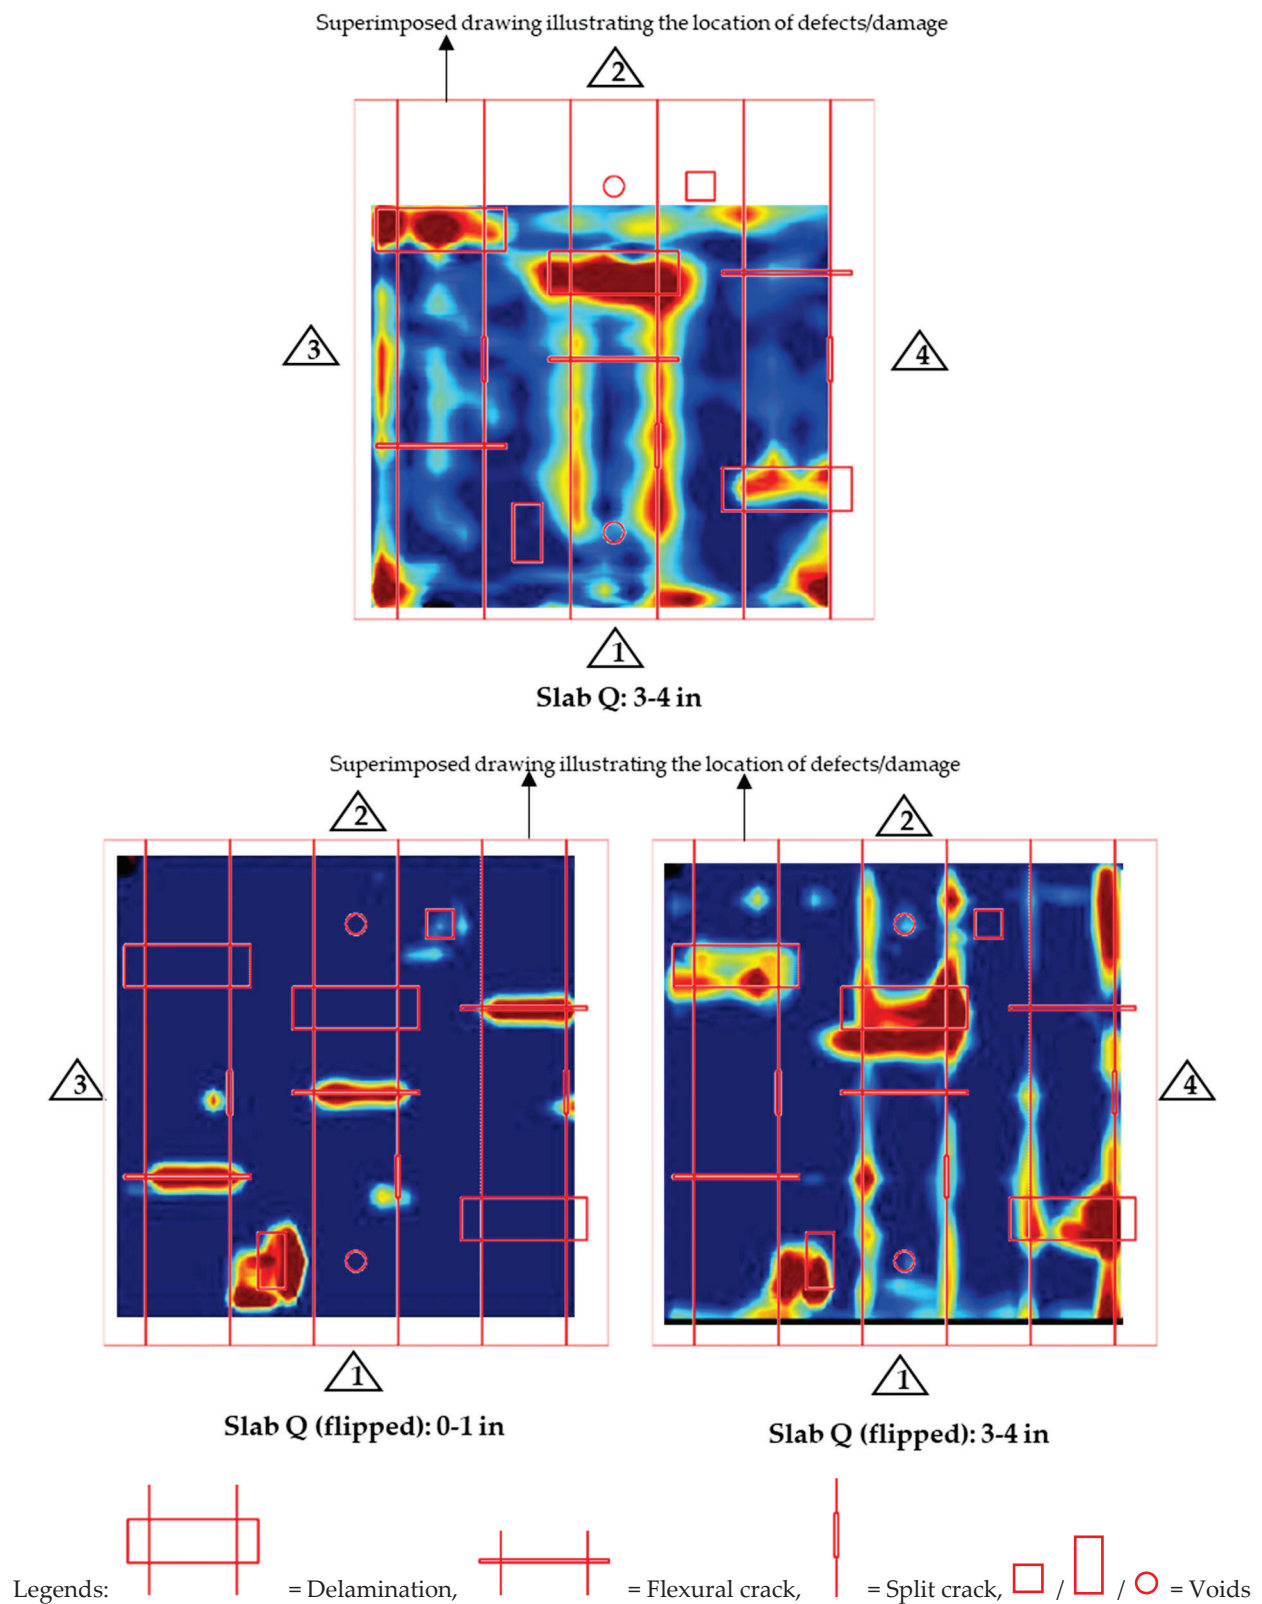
Depth slices of slab Q for damage detection in concrete (from top and bottom surface).
